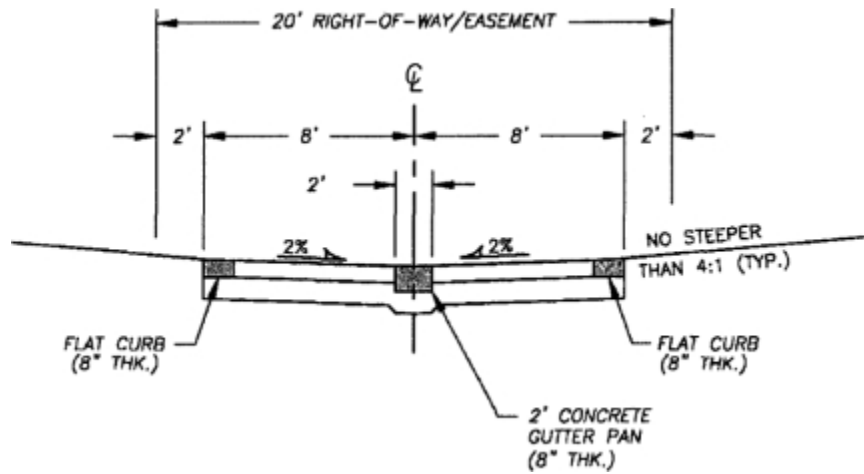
Narrow Lot Alley Cross-Section
